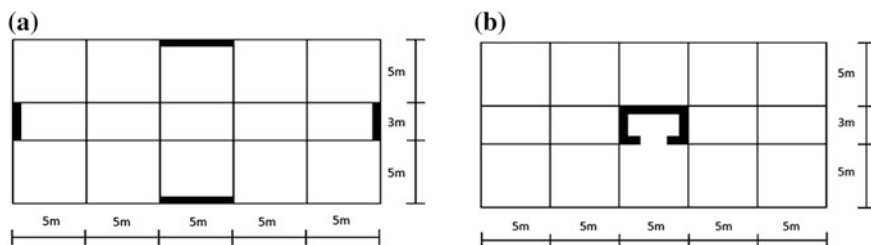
Plan of the considered buildings. a Shear-wall building (SW) b Shear-wall core building (SWC)
